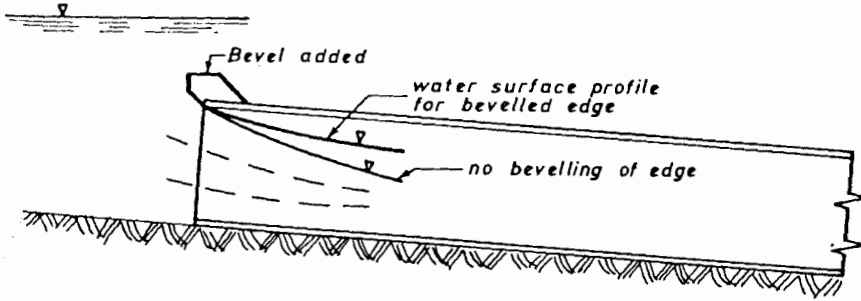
illustrates some possible inlet arrangements. The simplest type of improvement is a vertical head-wall on top of the entrance to the culvert in the case of a battered embankment. This eliminates the re-entrant angle. The next step would be to bevel the top of the inlet. The bevel should be at least 10% of the culvert height at 33° to 45° to the axis of the culvert. In the case of skew culverts, the acute approach edge should also be bevelled. This will increase flow by up to 20%.
